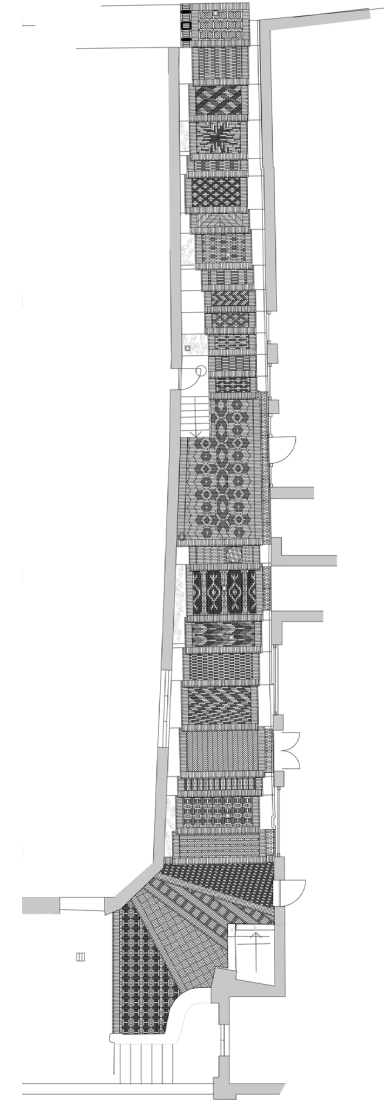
flooring plan, Munkestræde, NOAA architects, Svendborg
